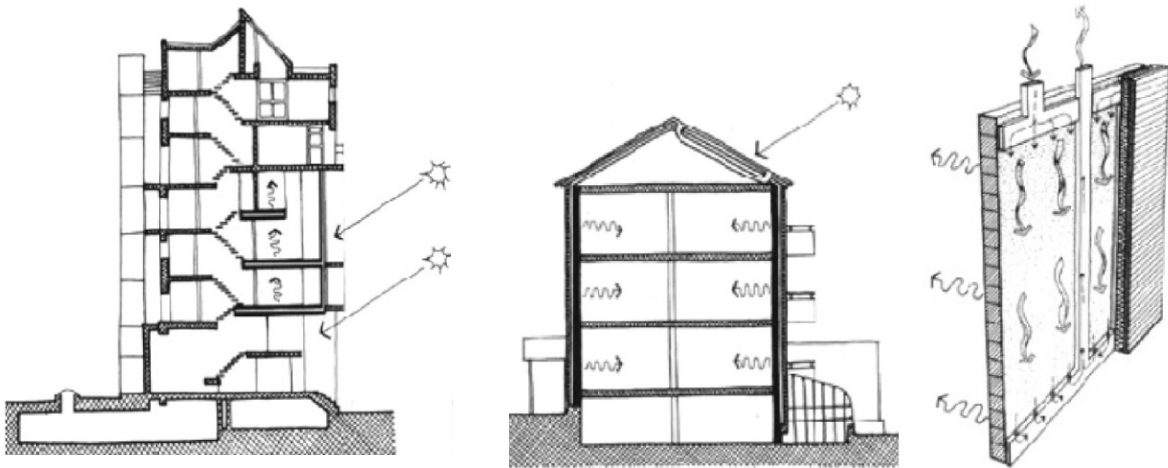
A Hypocaust in the Lutzstrasse Berlin: 7 B and 7 C Murocaust apartment Block in Gothenburg (Hastings and Mørk 1999)
